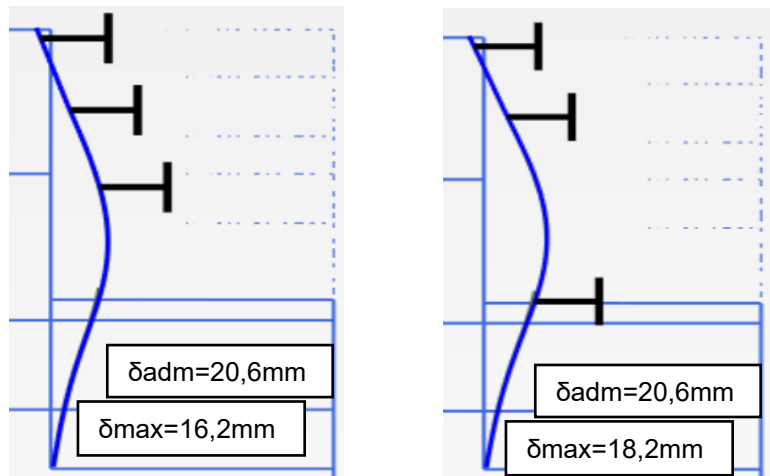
Section 2: Maximum horizontal displacements: Original (left); Alternative (right)
